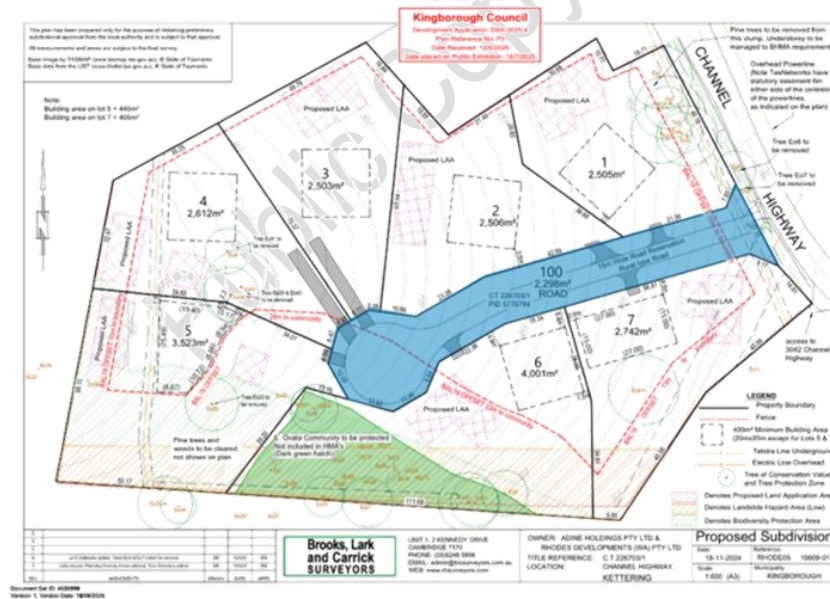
Extract from advertised plans showing proposed 'Harbour View Rise' in blue
